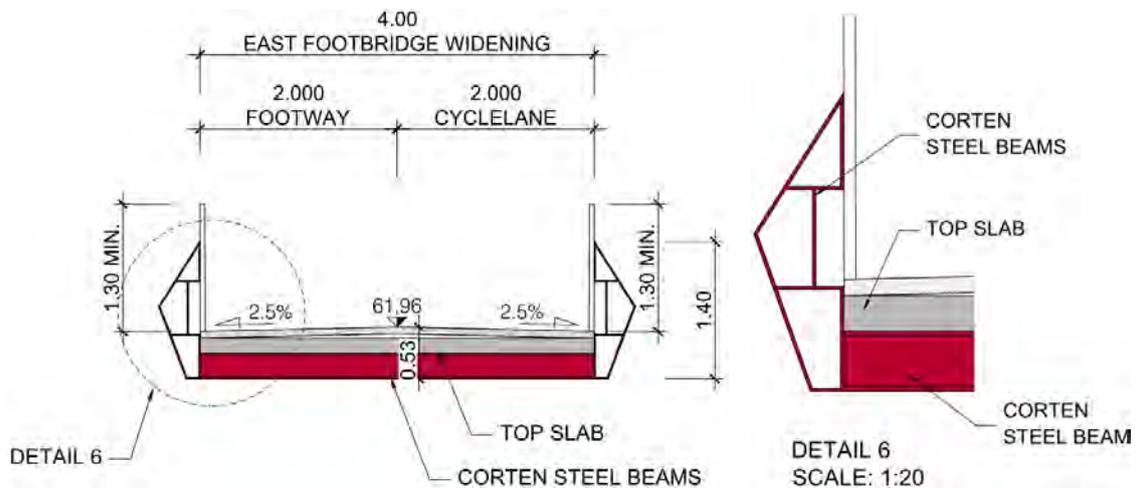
Cross section of footbridge deck (indicative cross section outside of railway area)
